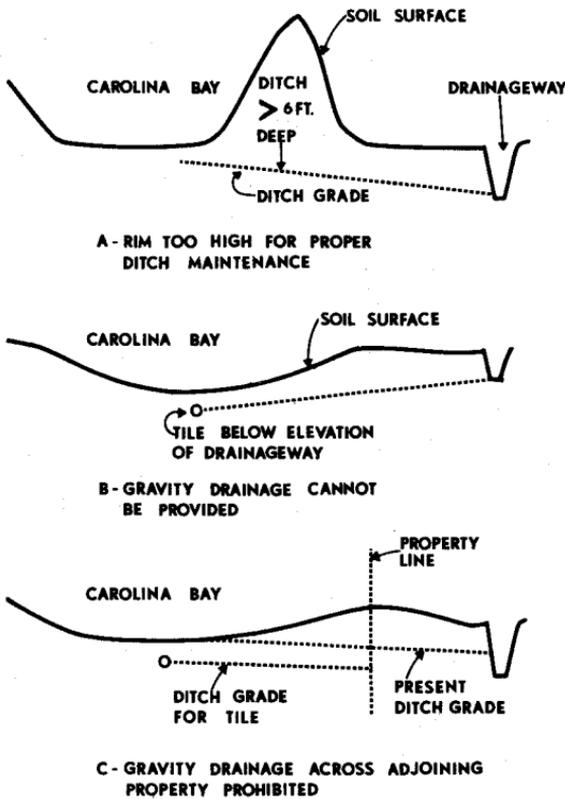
Three Situations Where Pump-Assisted Drainage Can Be Used to Achieve Proper Drainage Outlet
